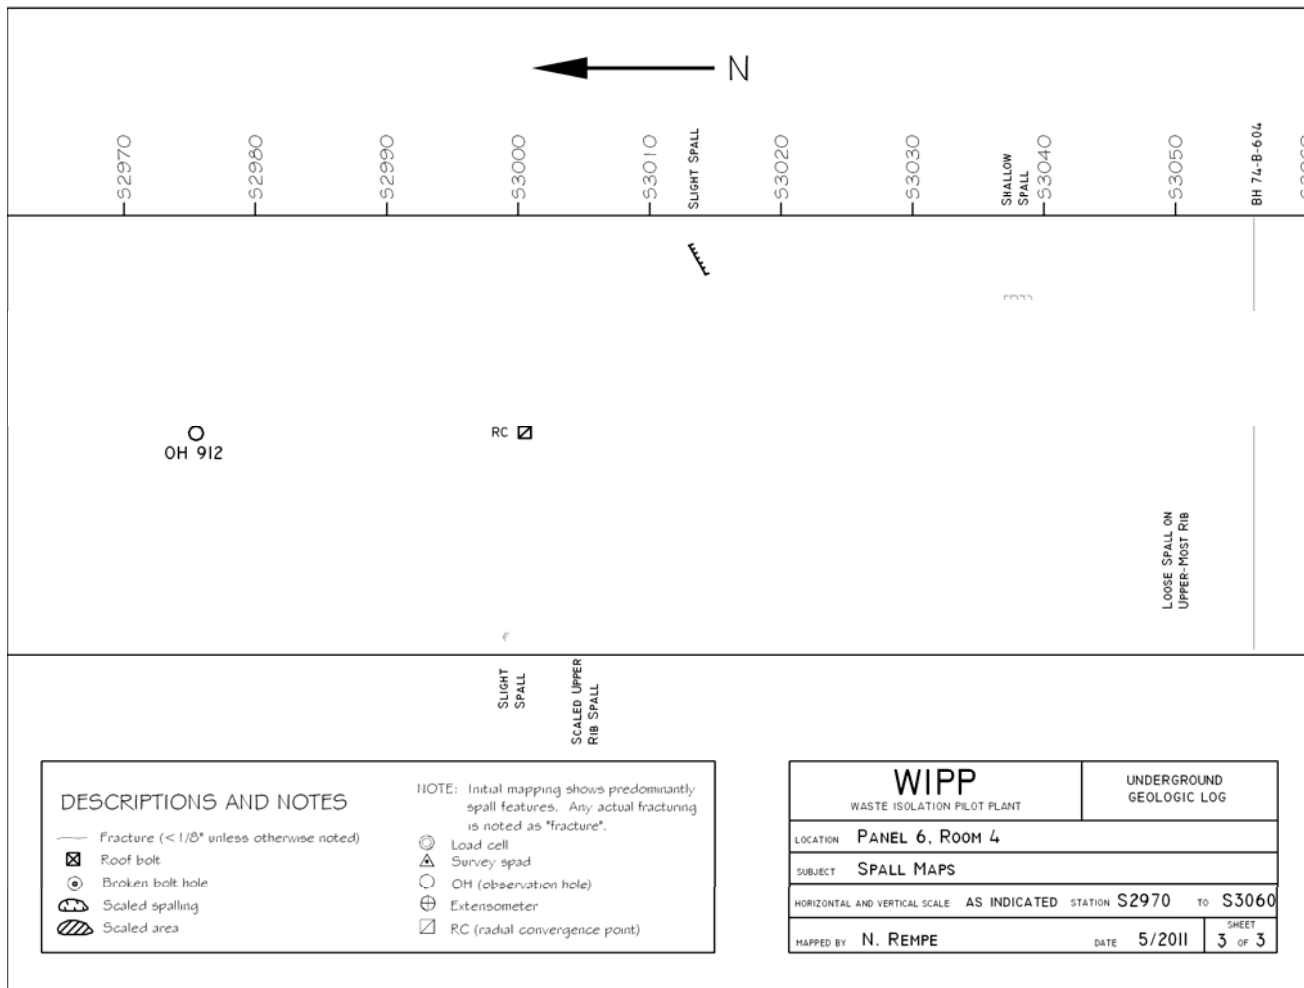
Panel 6 Room 4, S2770-S3060 Roof Fractures (Sheet 3 of 3)
